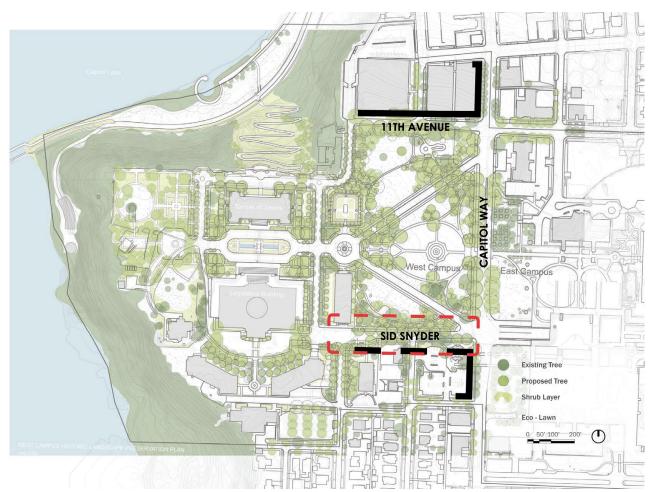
COMPRESSION PLAN. NOTE: SITE PLAN SHOWS THE 2009 HISTORIC LANDSCAPE PRESERVATION PLAN OF THE 1928 OLMSTED BROTHERS AND WILDER & WHITE PLAN
